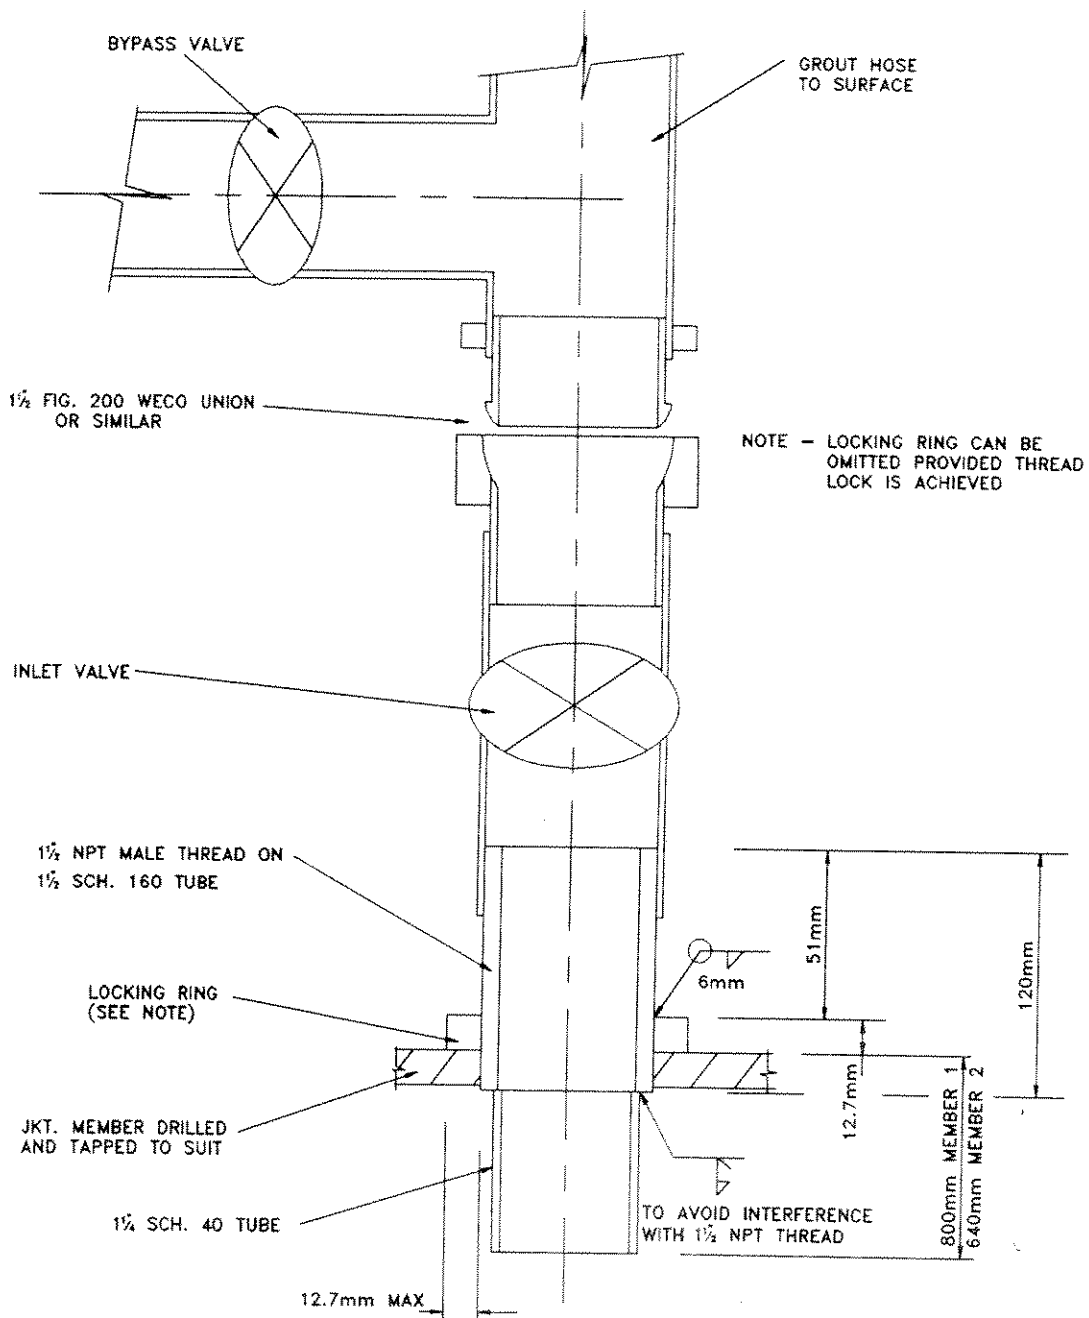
ARRANGEMENT OF GROUT INLET CONNECTIONS
